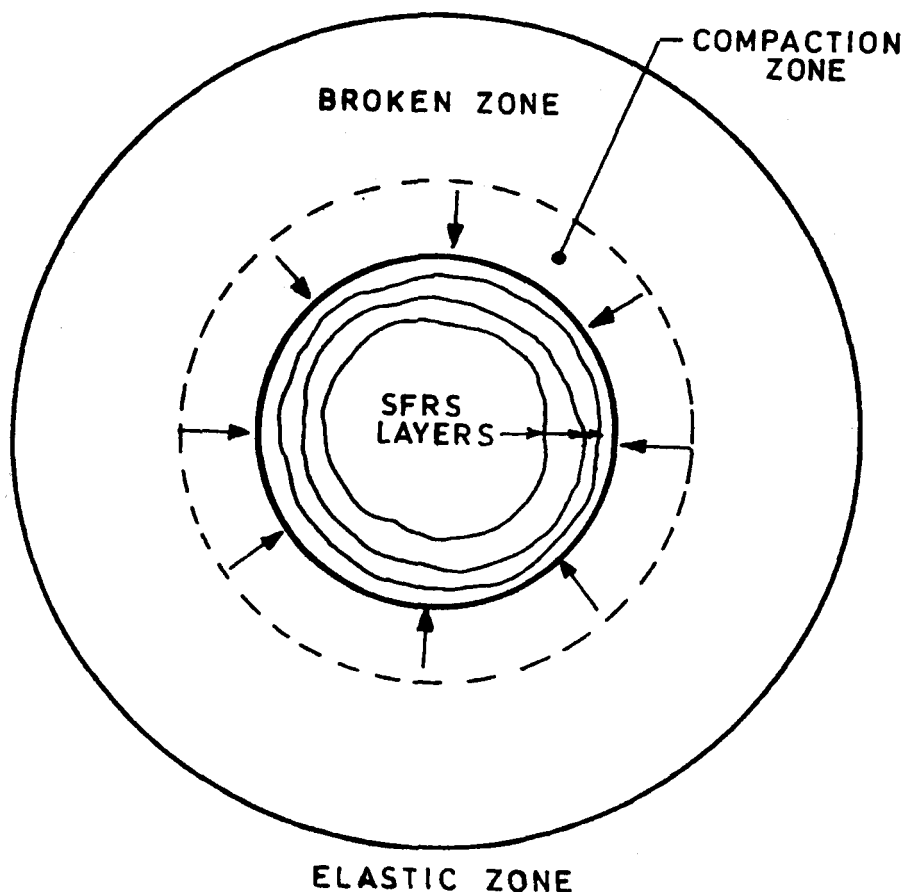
STABILIZATION OF BROKEN ZONE IN SQUEEZING GROUND CONDITION
